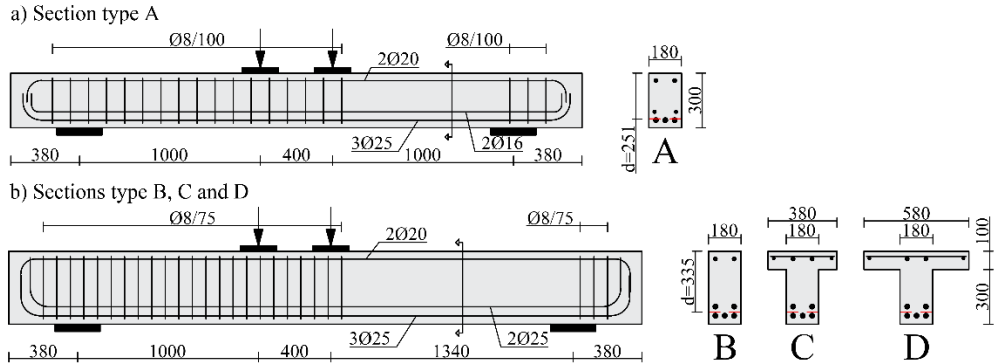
Geometry and reinforcement of the test specimens: a) specimens with section type A; b) specimens with sections type B, C and D (units: mm).
